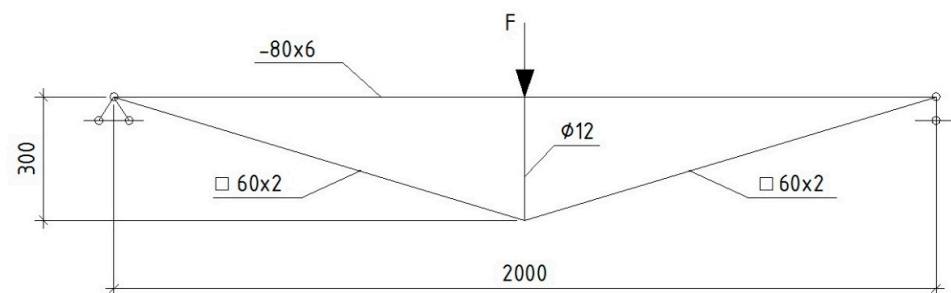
Geometric scheme of truss No. 1 (loss of stability and destruction of the upper chord).
